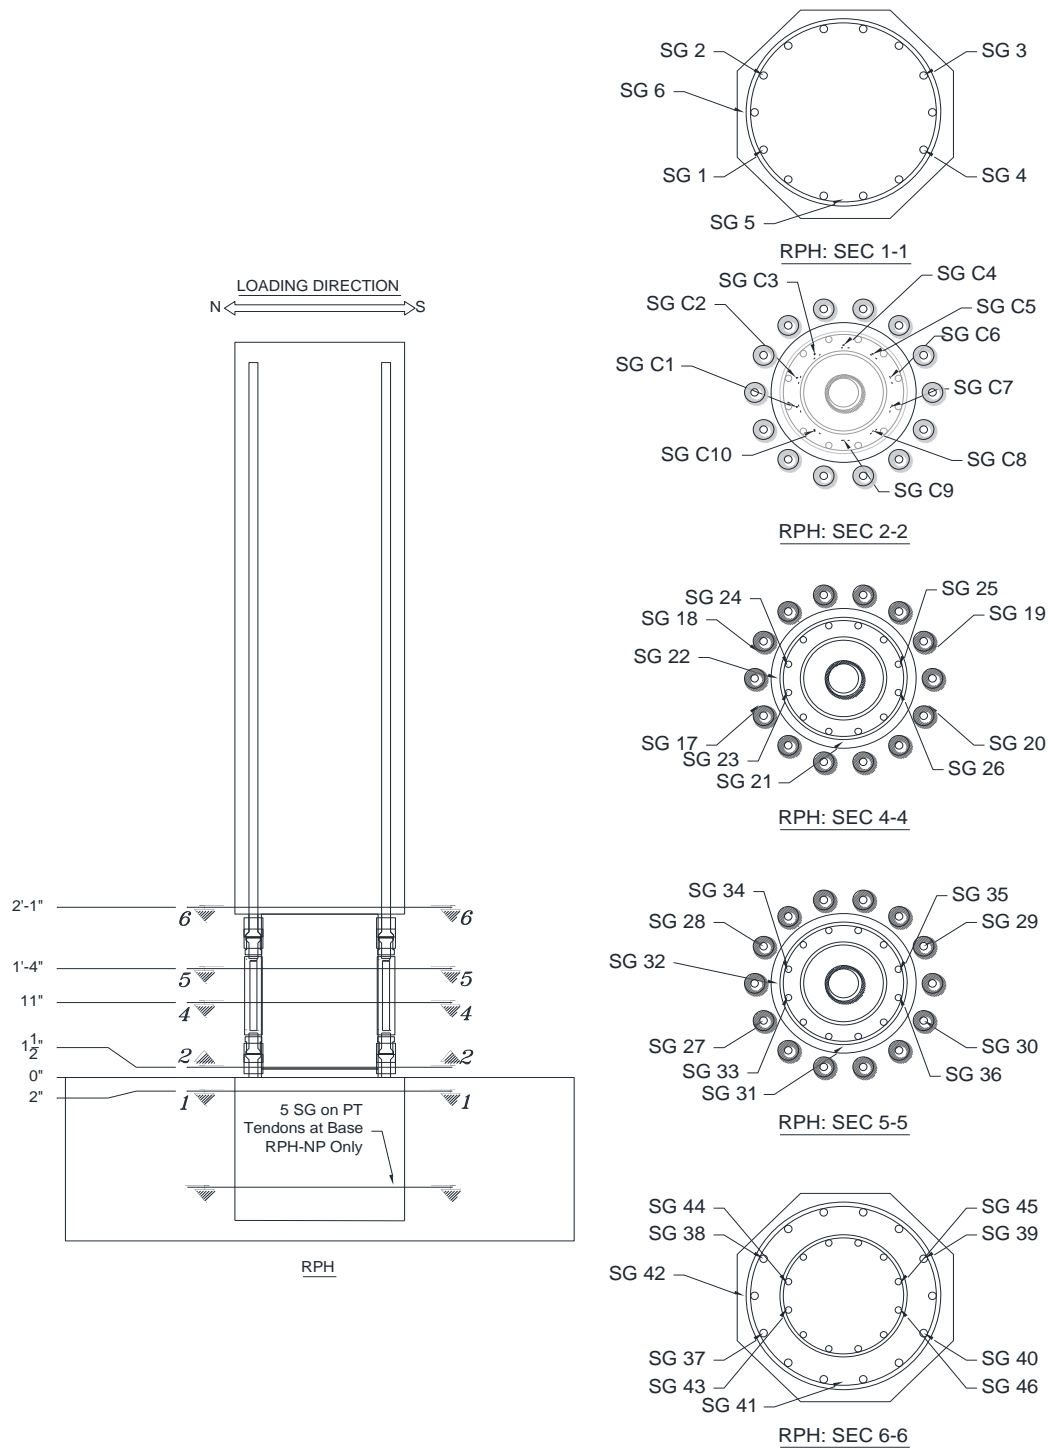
Typical Strain Gauge Plan Used in Repairable Precast Columns
